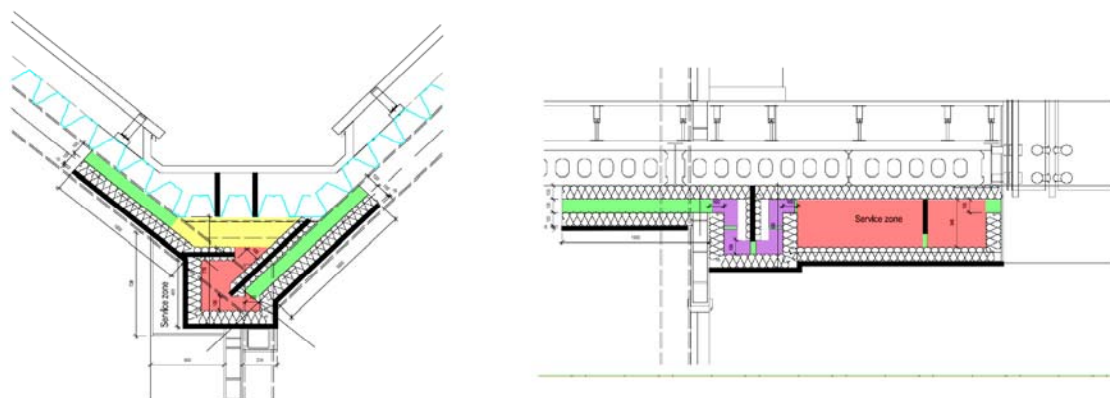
Section through bespoke attenuator – Left first floor – Right Ground Floor – School H
